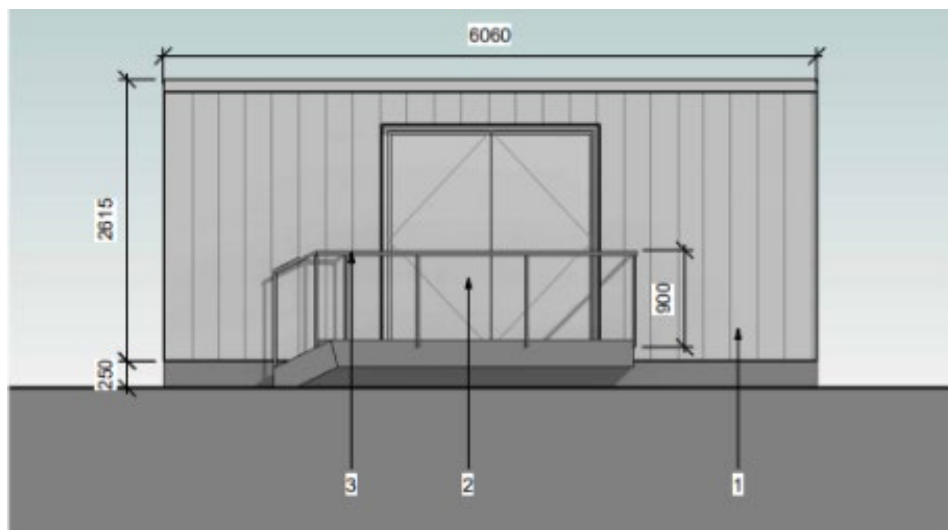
Modular Storage/Workshop Unit West Elevation
